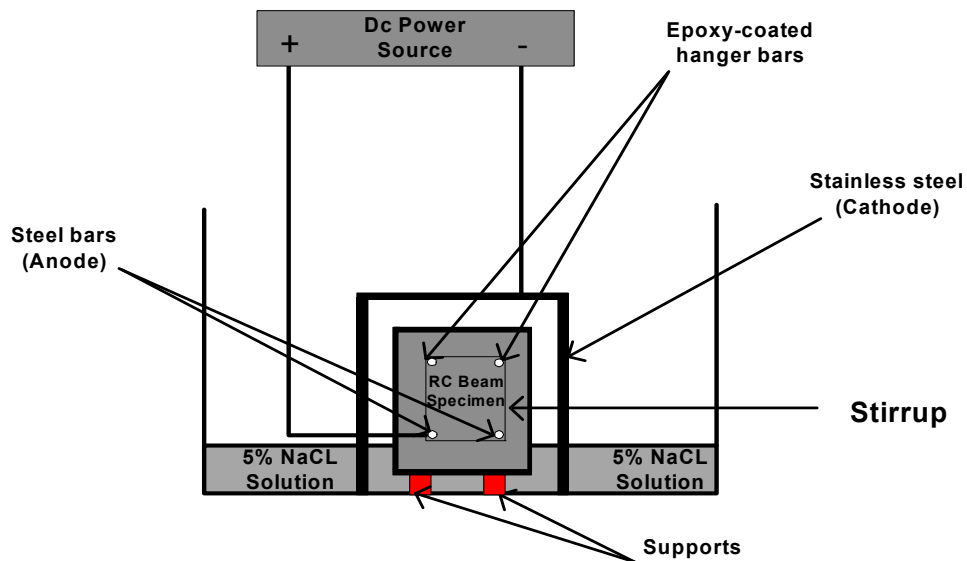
Set-up for accelerating reinforcement corrosion in large-size reinforced concrete beam specimen [20].
